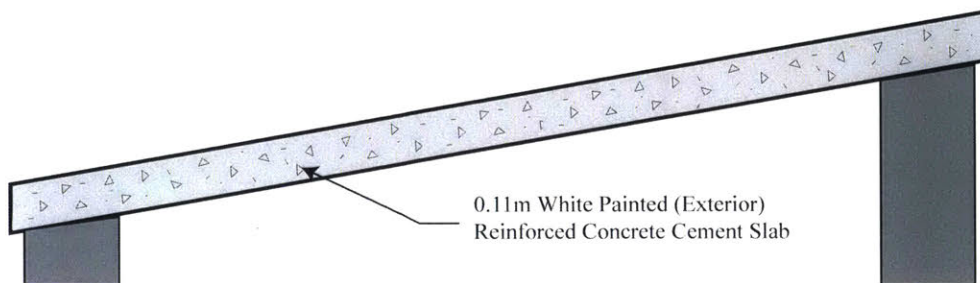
R2 | Reinforced Concrete Cement (RCC) Roof
